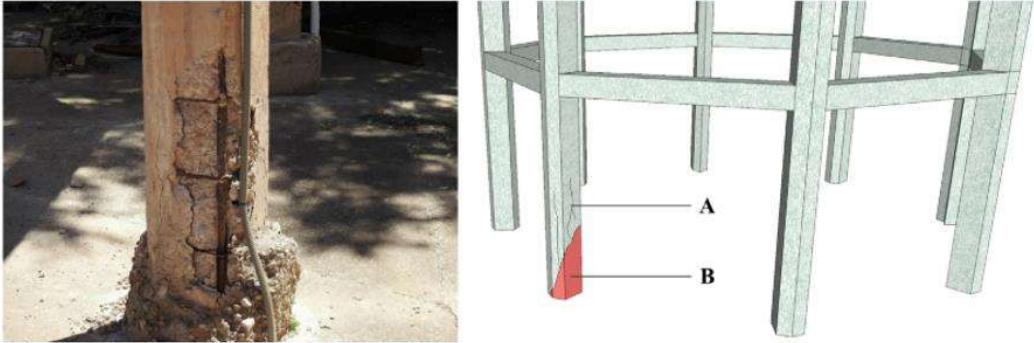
Recurrent damage: Wet areas, cracks & concrete spalling columns near foundation [Sangiorgio et al., 2013]
